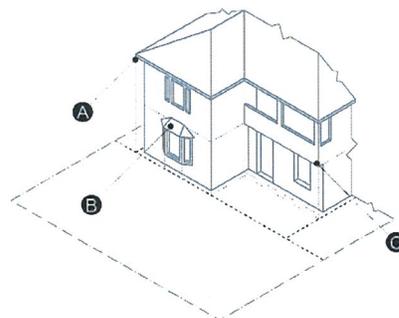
A structure where all architectural projections, including but not limited to bay windows ('A'), roof eaves ('B') and porch coverings ('C') are placed within the Principal Building Area.
